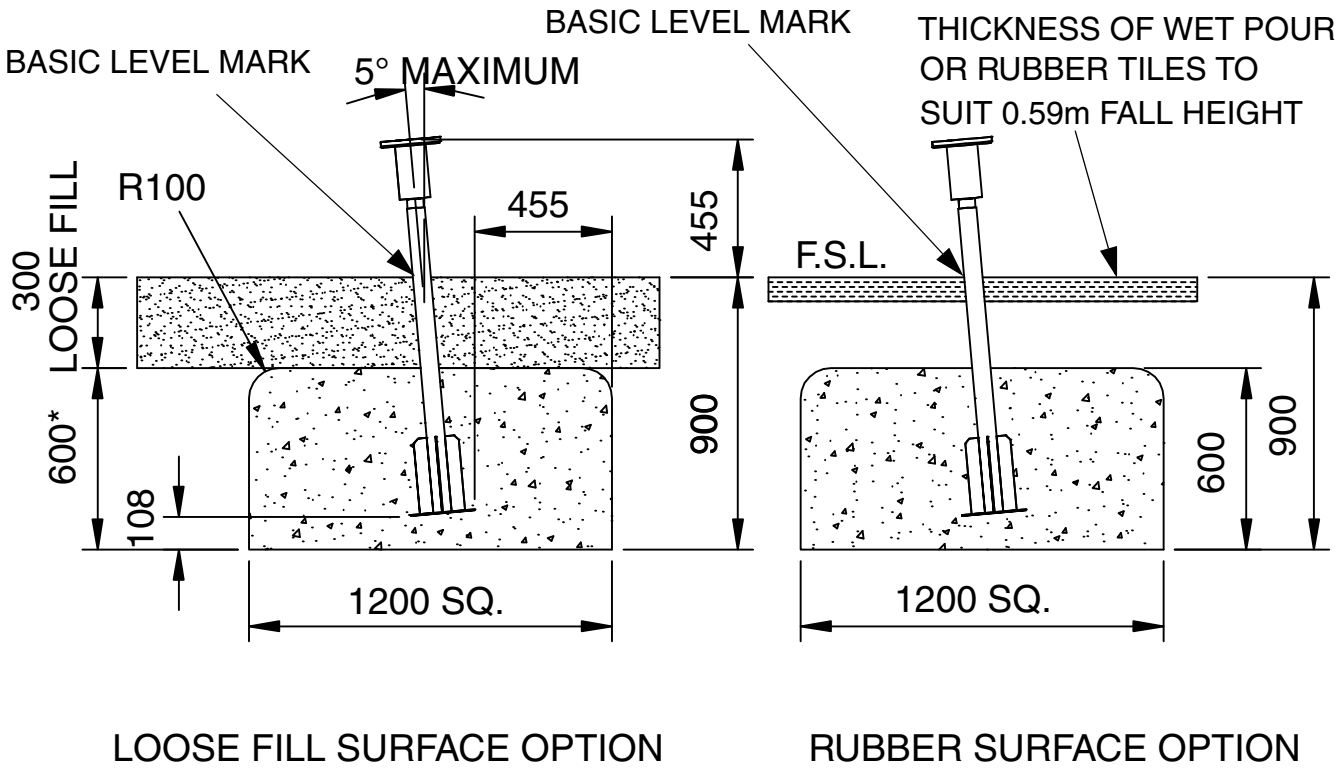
EXCAVATIONS SHAFT AND BEARING ASSEMBLY
